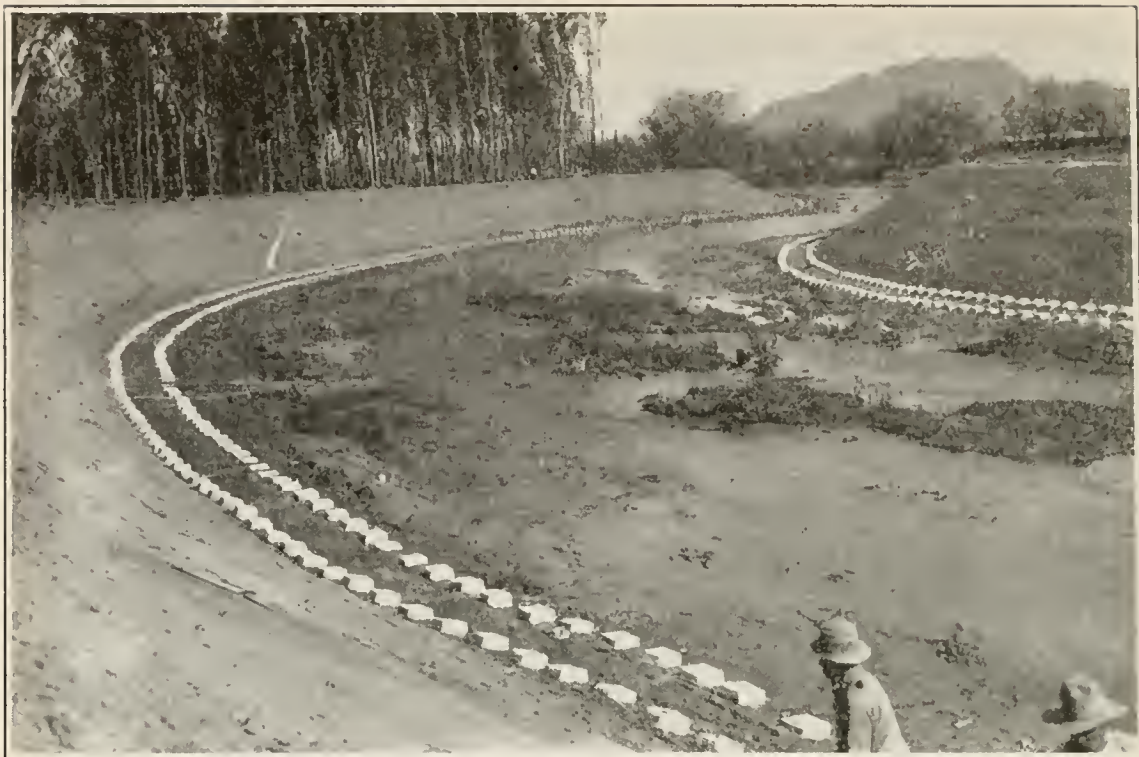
Los Angeles River. Gunite construction, looking downstream from Pacoima Avenue.
